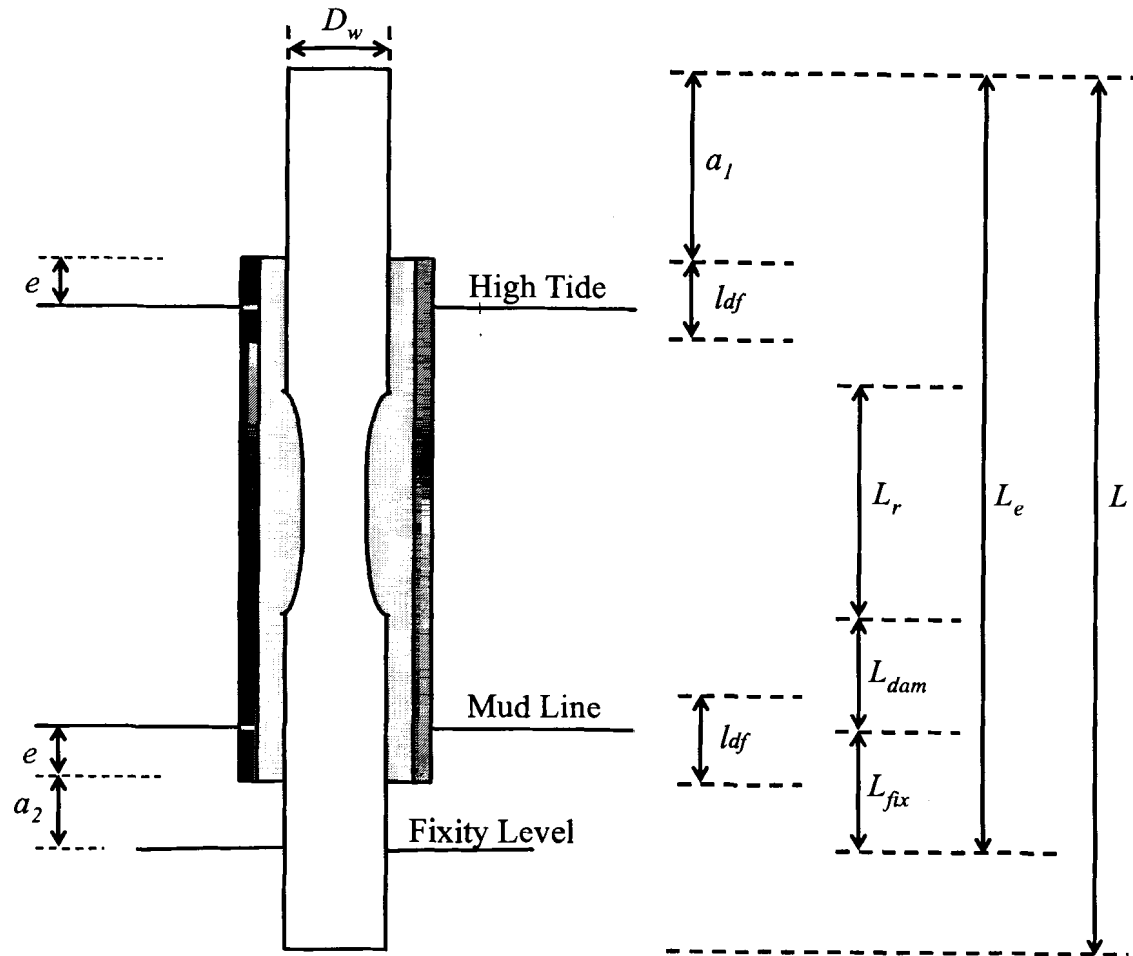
Schematic of Cantilever Model of Typical Wood Pile
